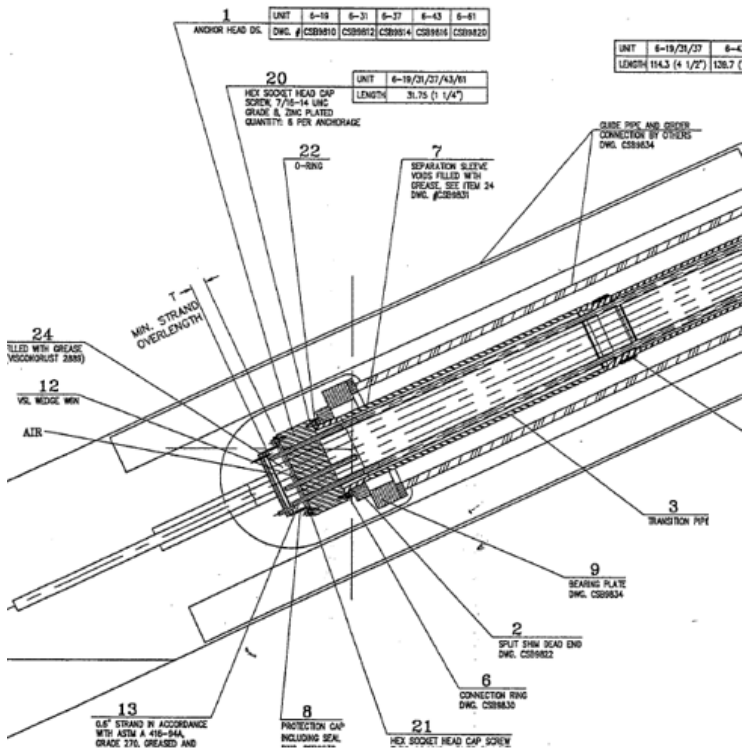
Deck Anchorage Sectional View Showing Strand Wedge Anchor.
